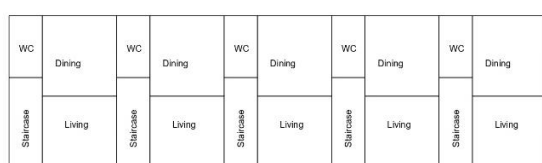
Ground Floor Plan: Affordable Housing Condominium-Type
